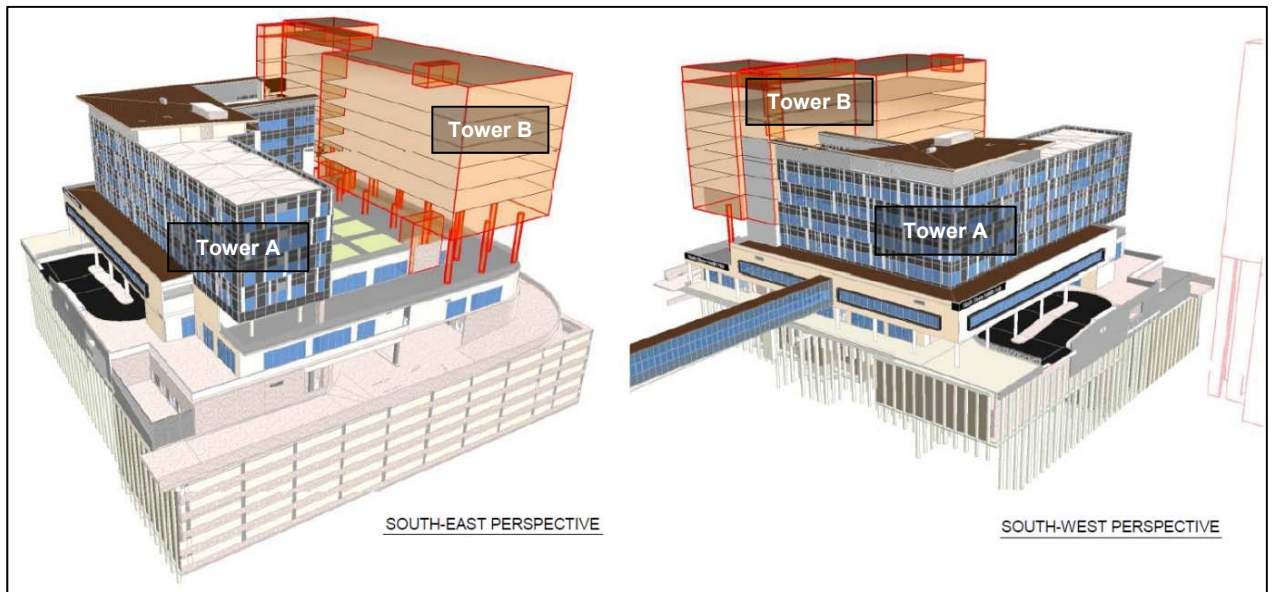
Perspectives of Tower A and Tower B building envelope (Base source: Tower B concept RtS)
